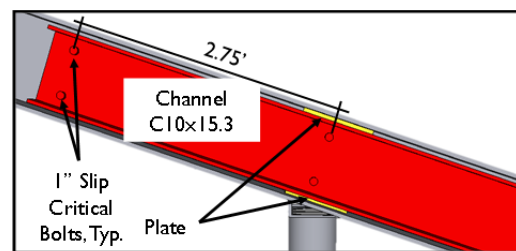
Frame mitigation design to prevent bending failure with existing frame (gray) and retrofit channel (red)
